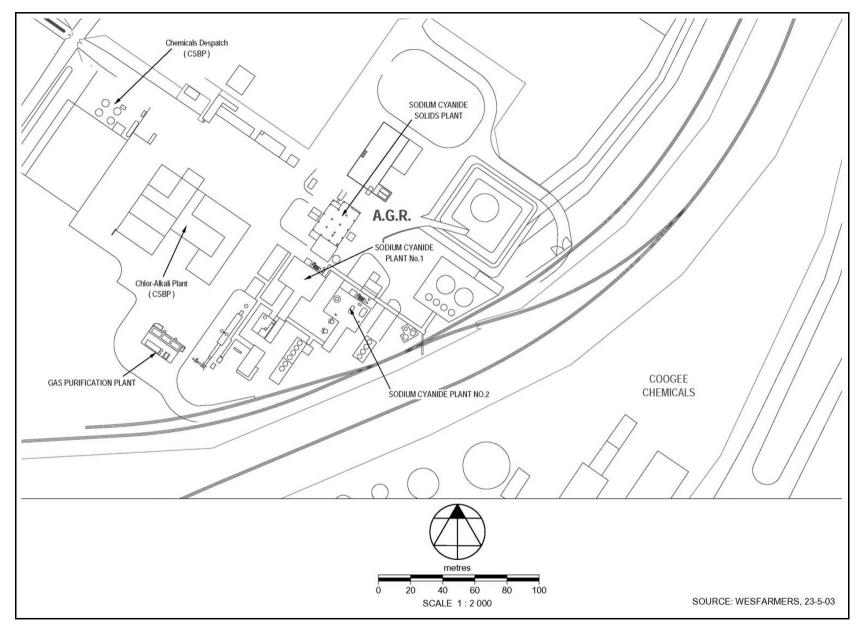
Site Plan of AGR's Facility (Source: ATA Environmental, 2003)
